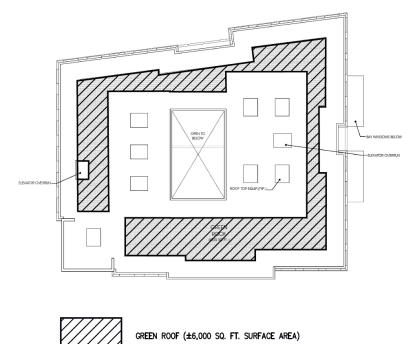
Green Roof Diagram from Sheet P-0501 from the applicant's concept plans
